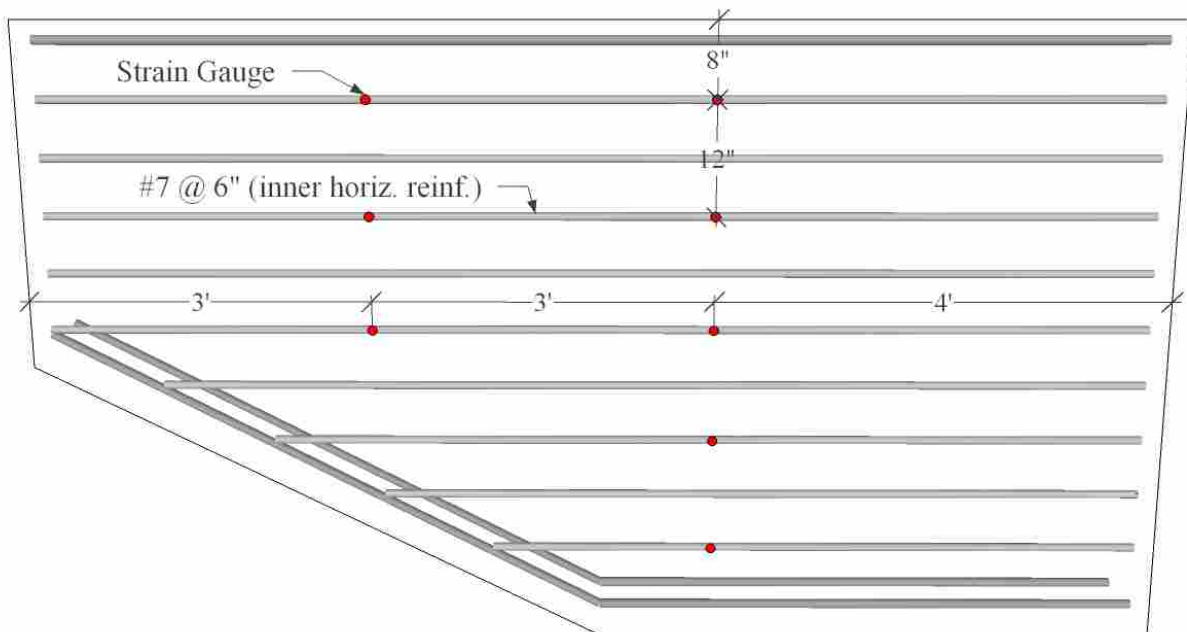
Wingwall strain gage locations (Smith 2014).
